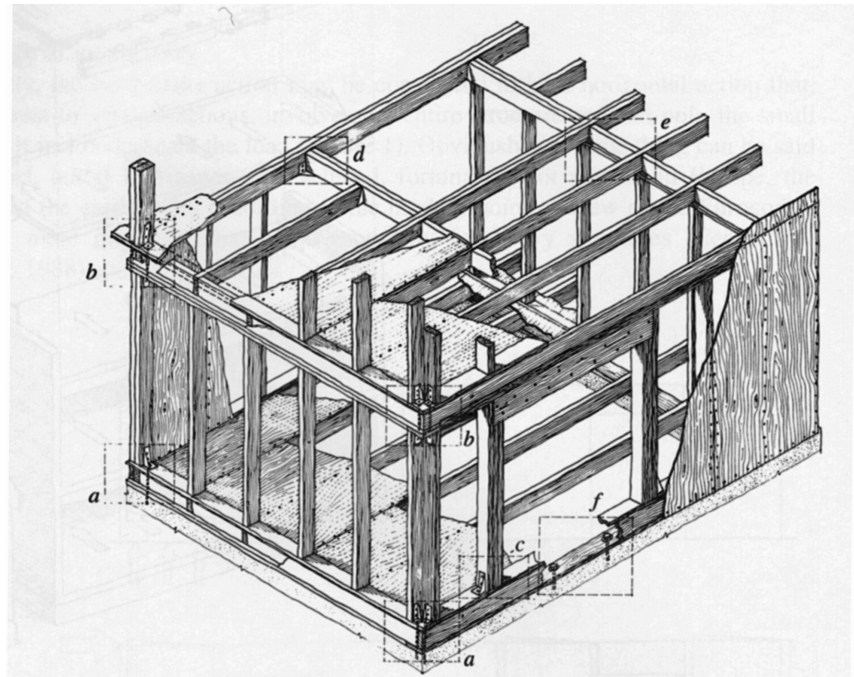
Details assuring structural continuity under horizontal actions. (a) corner reinforcement; (b) tension girder continuity; (c) continuity of tension studs; (d) prevention of uplifting from foundation and sliding of foundation.
